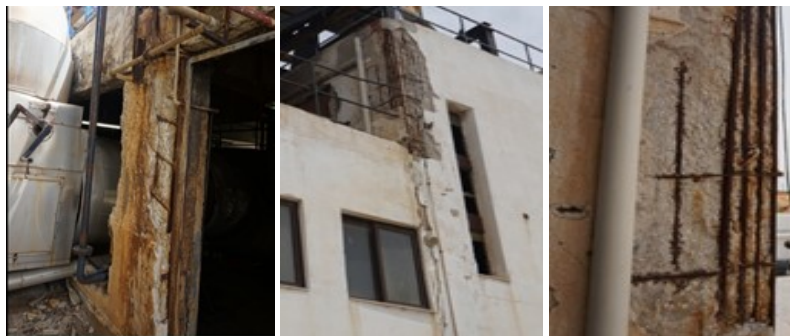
Concrete cover spalling, steel rebar corrosion and loss of concrete cross-section.
